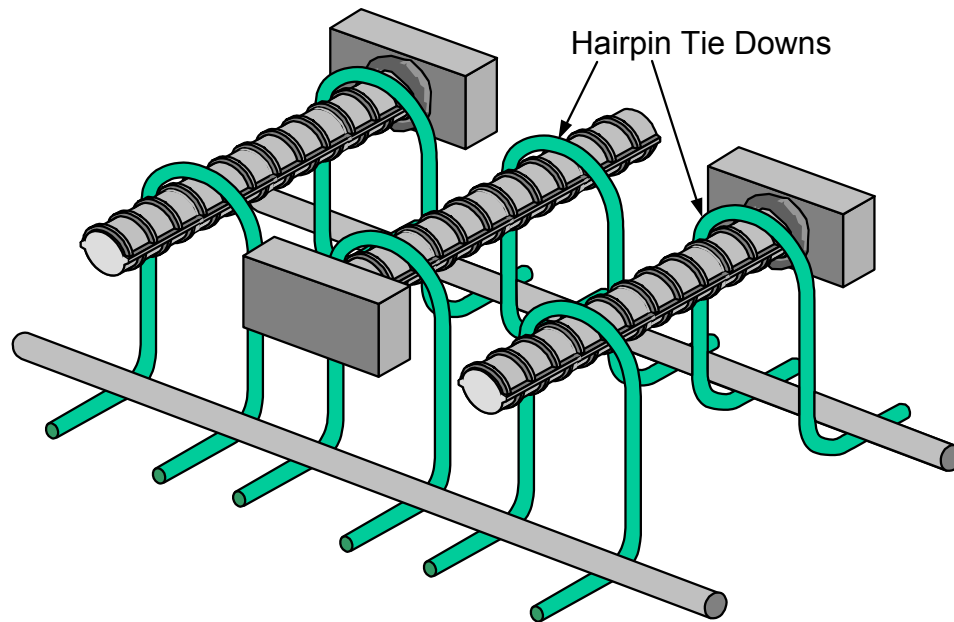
Reinforcement details of unconfined lap splice specimens
